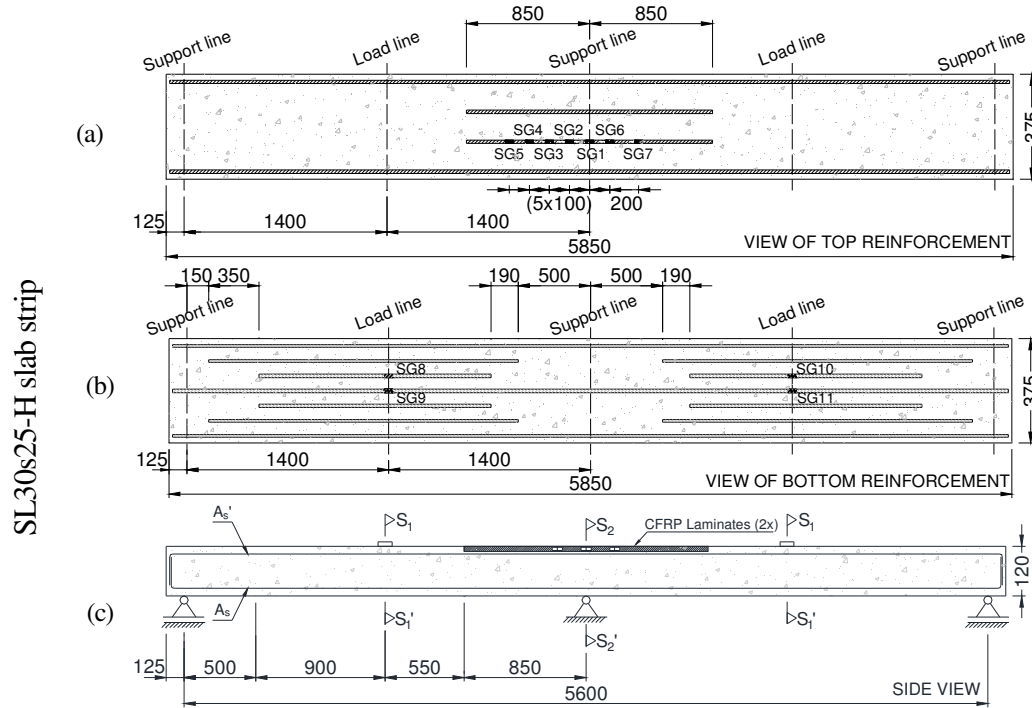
Arrangement of the (a-b) longitudinal steel reinforcement and (c) CFRP laminates of the SL30s25-H slab strip.
